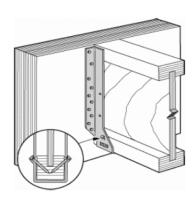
ALTERNATE MIU JOIST HANGER INSTALLATION (See Footnotes 3 and 4 to Table 8)
